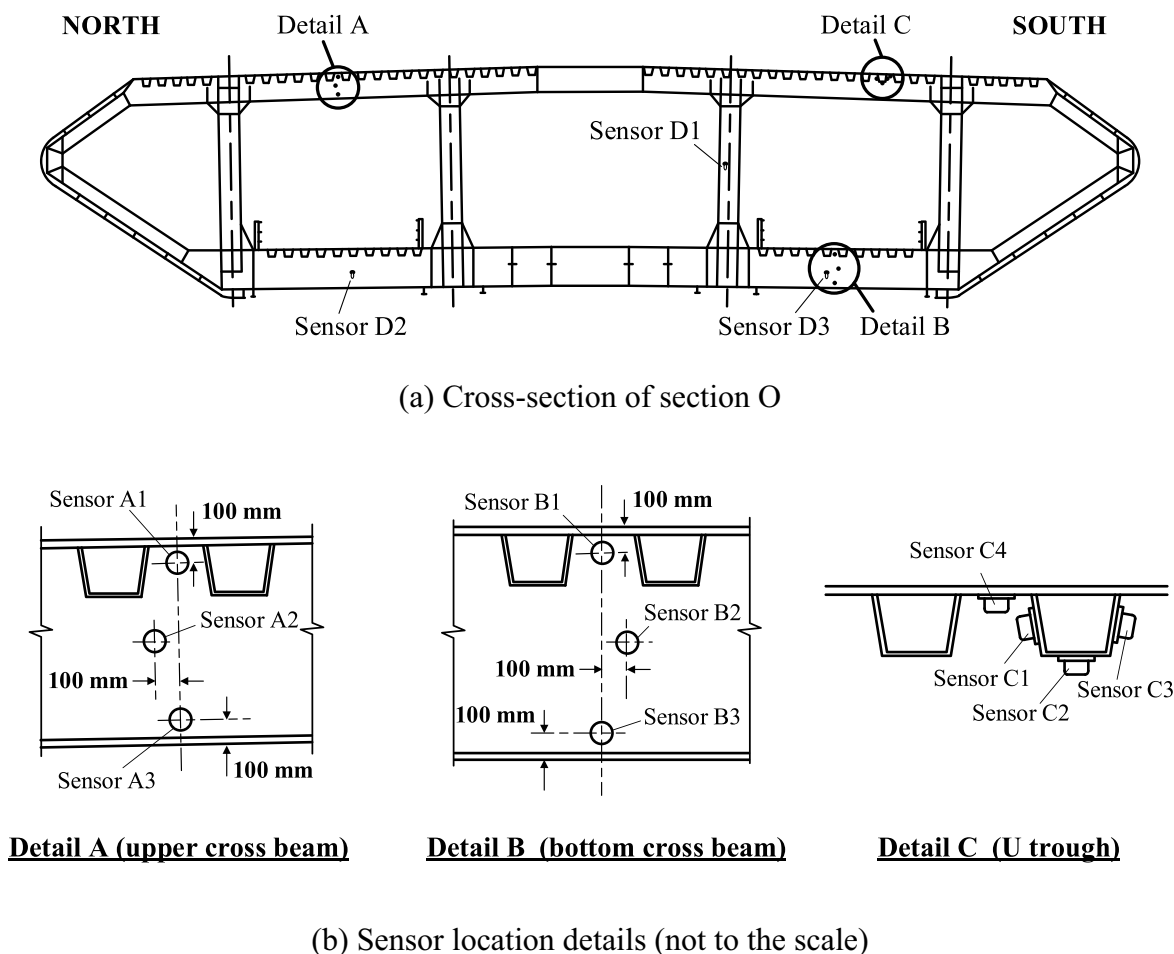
Sensor arrangement of section O. (a) Cross-section of section O. (b) Sensor location details (not to the scale)
